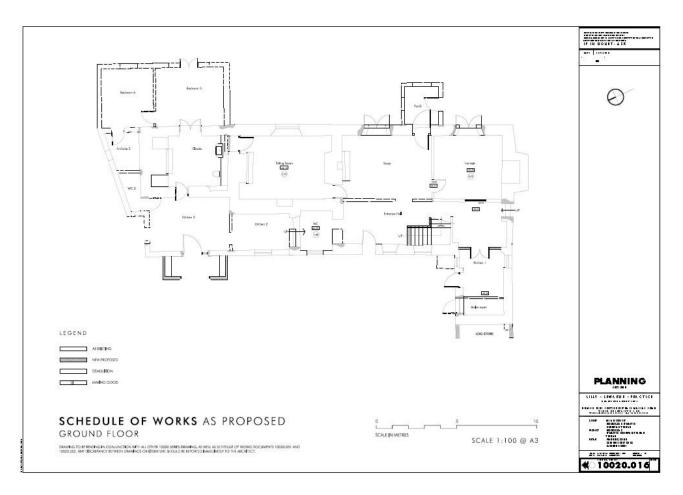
Bosloggas - Ground Floor Plan of Manor House (©Lilly.Lewarne Jan 2011).
